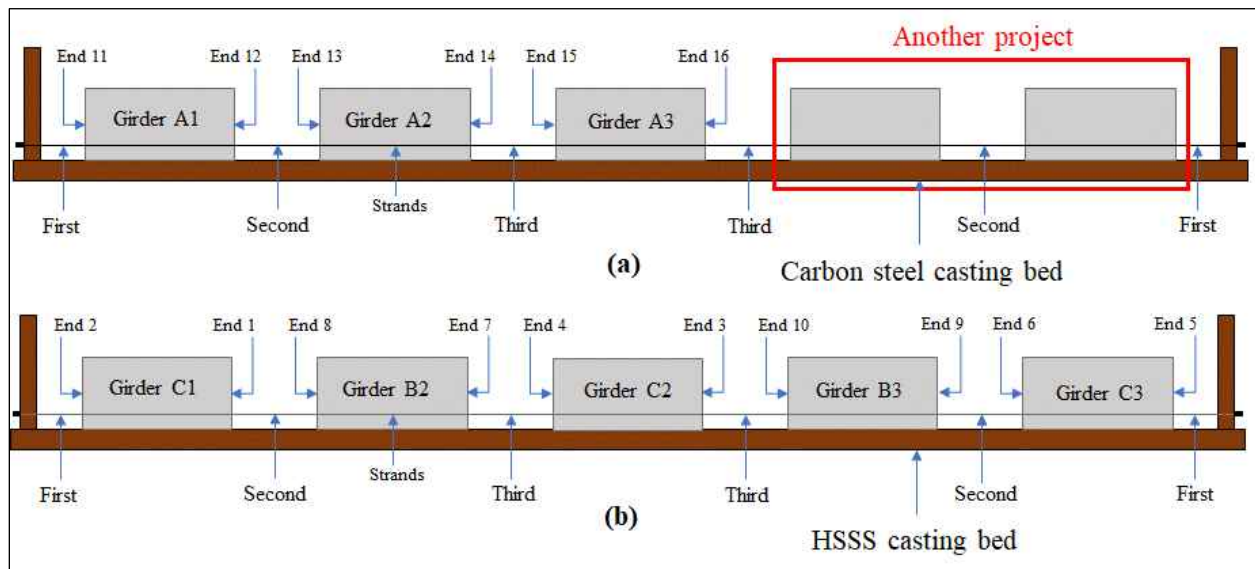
Casting bed layout and detensioning sequence for first set of girders. a) girders with carbon steel strands; and (b) girders with HSSS strands
